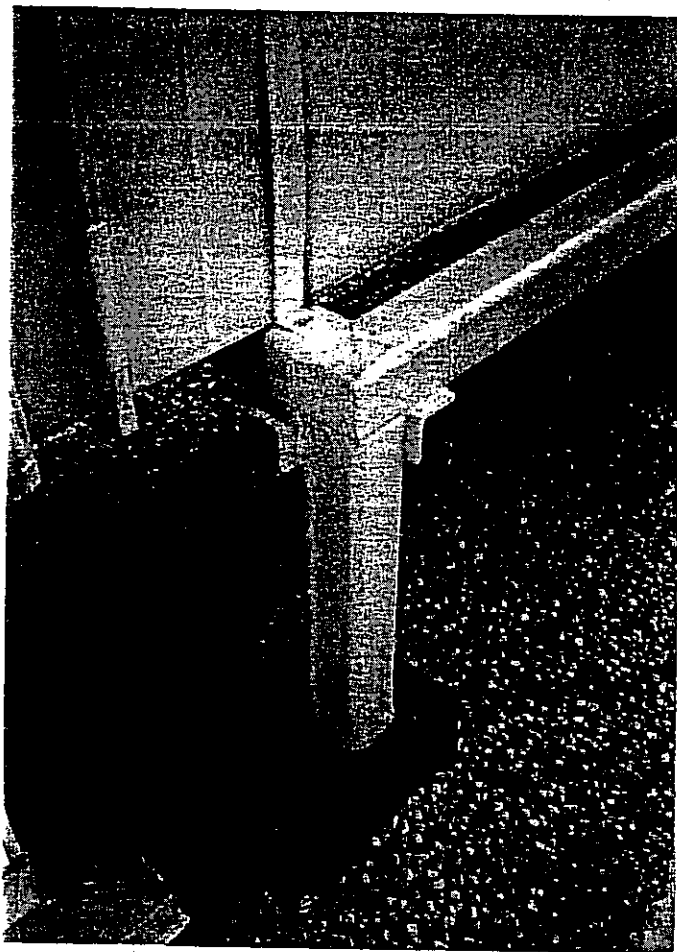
Some equipment supports at the roof level are rigidly anchored to the roof structure. Lateral bracing in both directions is recommended for legs supporting equipment over 18 inches above floor level.
